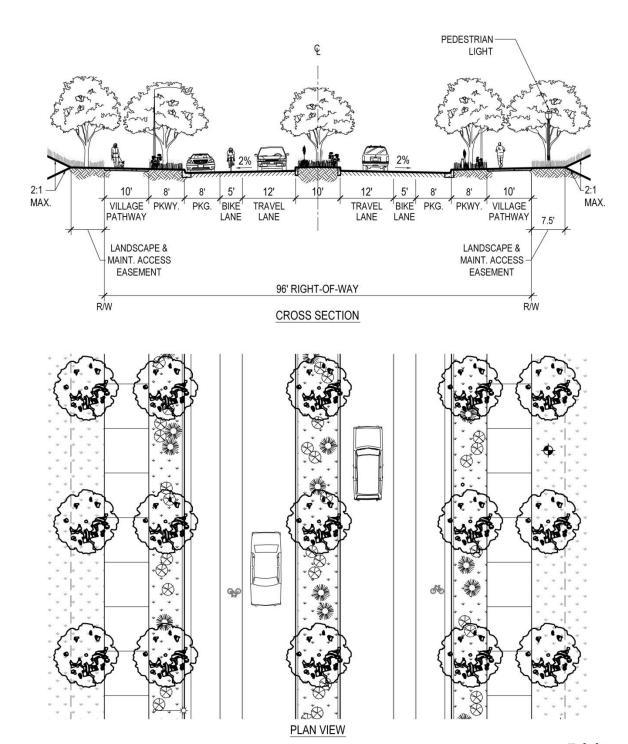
Modified 2-Lane Village Entry with Median & Village Pathway (Santa Macheto/Santa Picacho)
